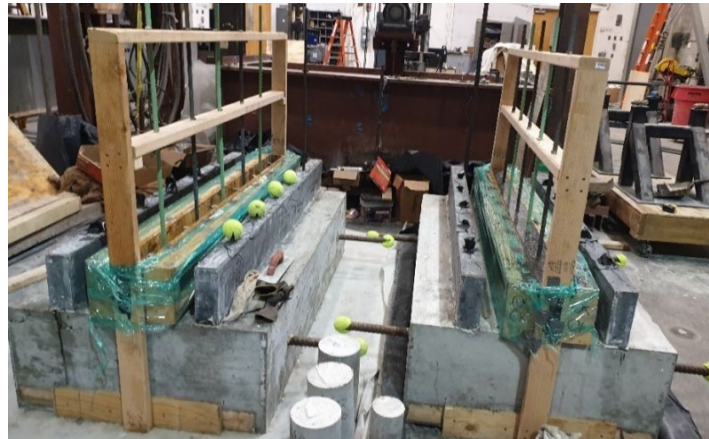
Pullout Specimens cast on Base Slabs 2 and 3
